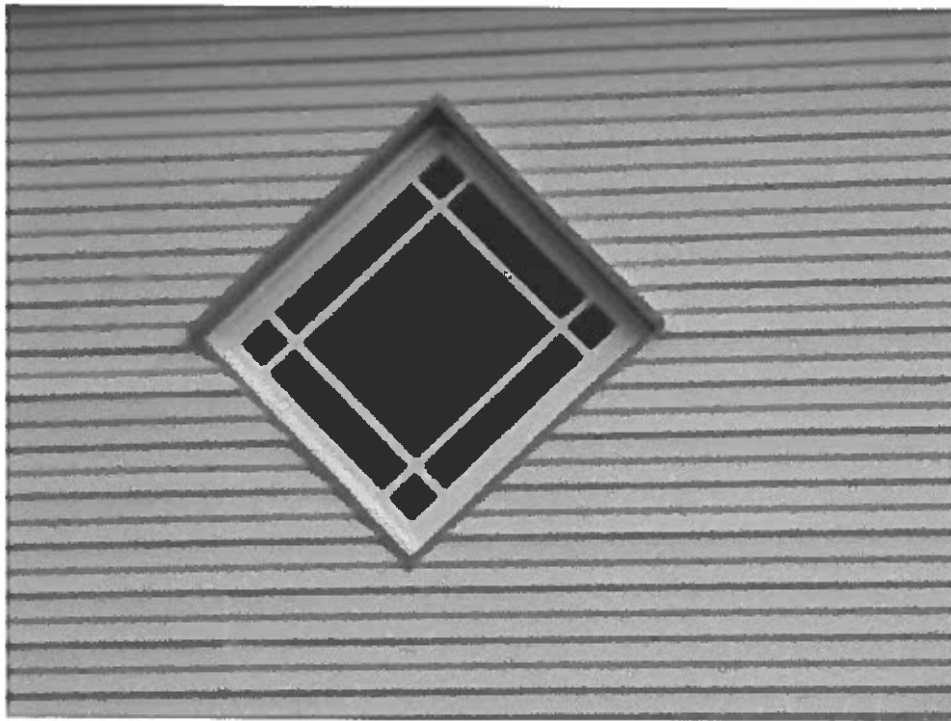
2<sup>nd</sup> floor diamond shape window to the north west room facing west. The window is not designed to be opened.
